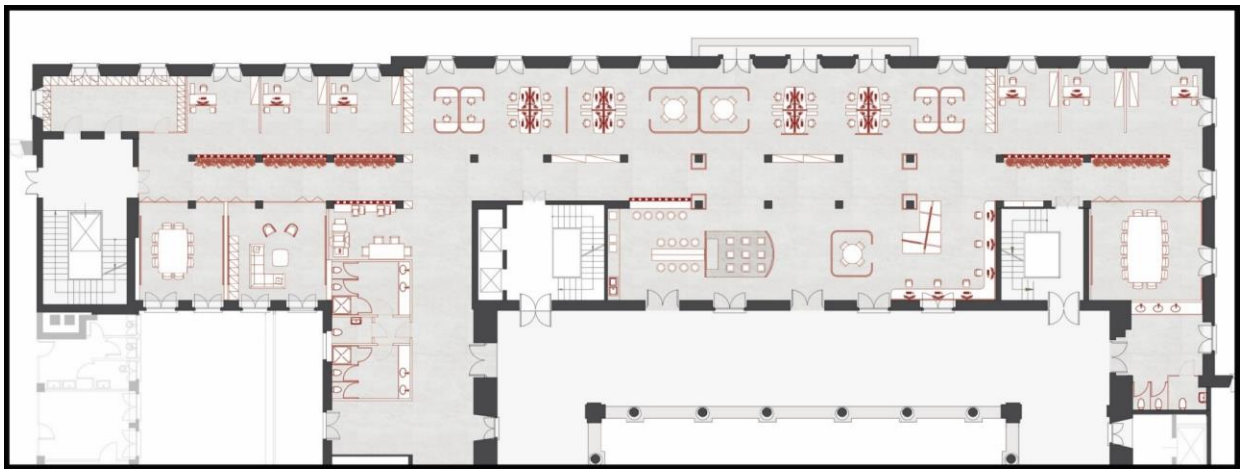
The proposed first-floor plan of the selected area (See Appendix 1). Scale 1:400 (Drawn by the author)
